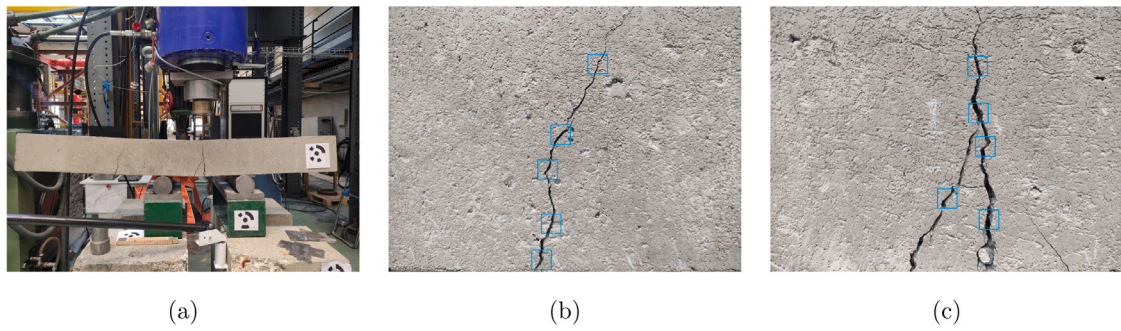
Crack kinematics for damaged beam—beam crack patterns: (a) beam set up, beam crack pattern with position of extracted patches of 256×256 px to measure the crack for (b) Pattern 1 and (c) Pattern 2.
